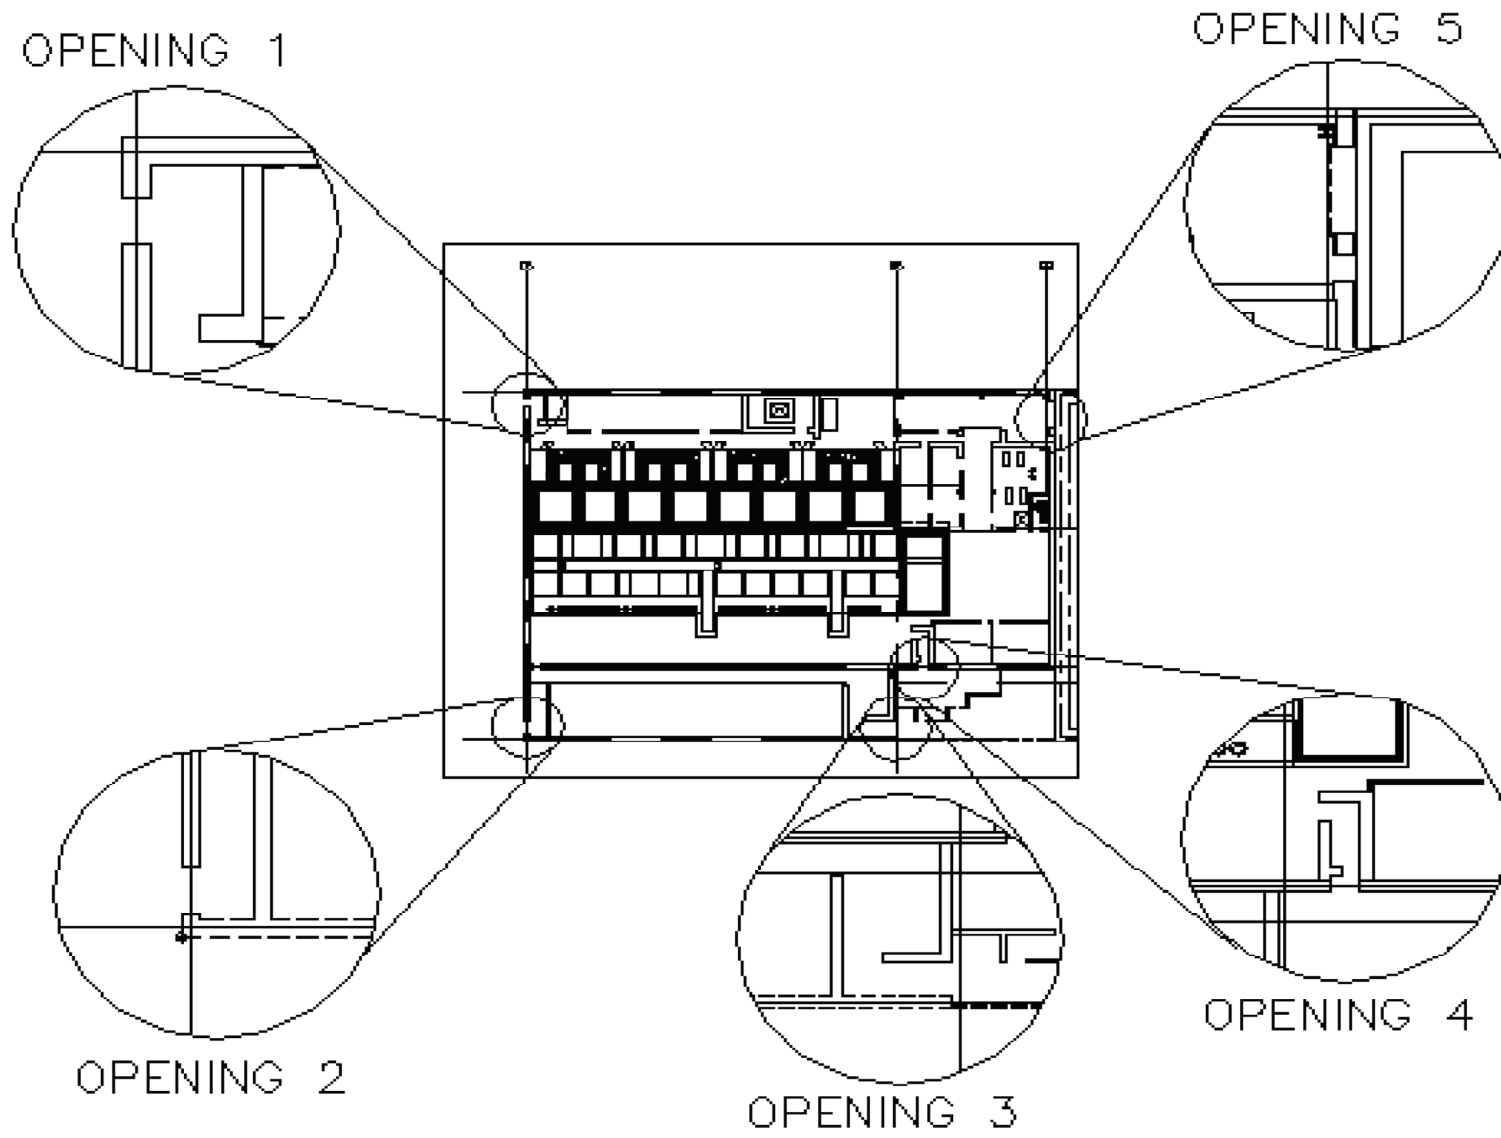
Building Envelope Openings Evaluated as Missile Barriers
